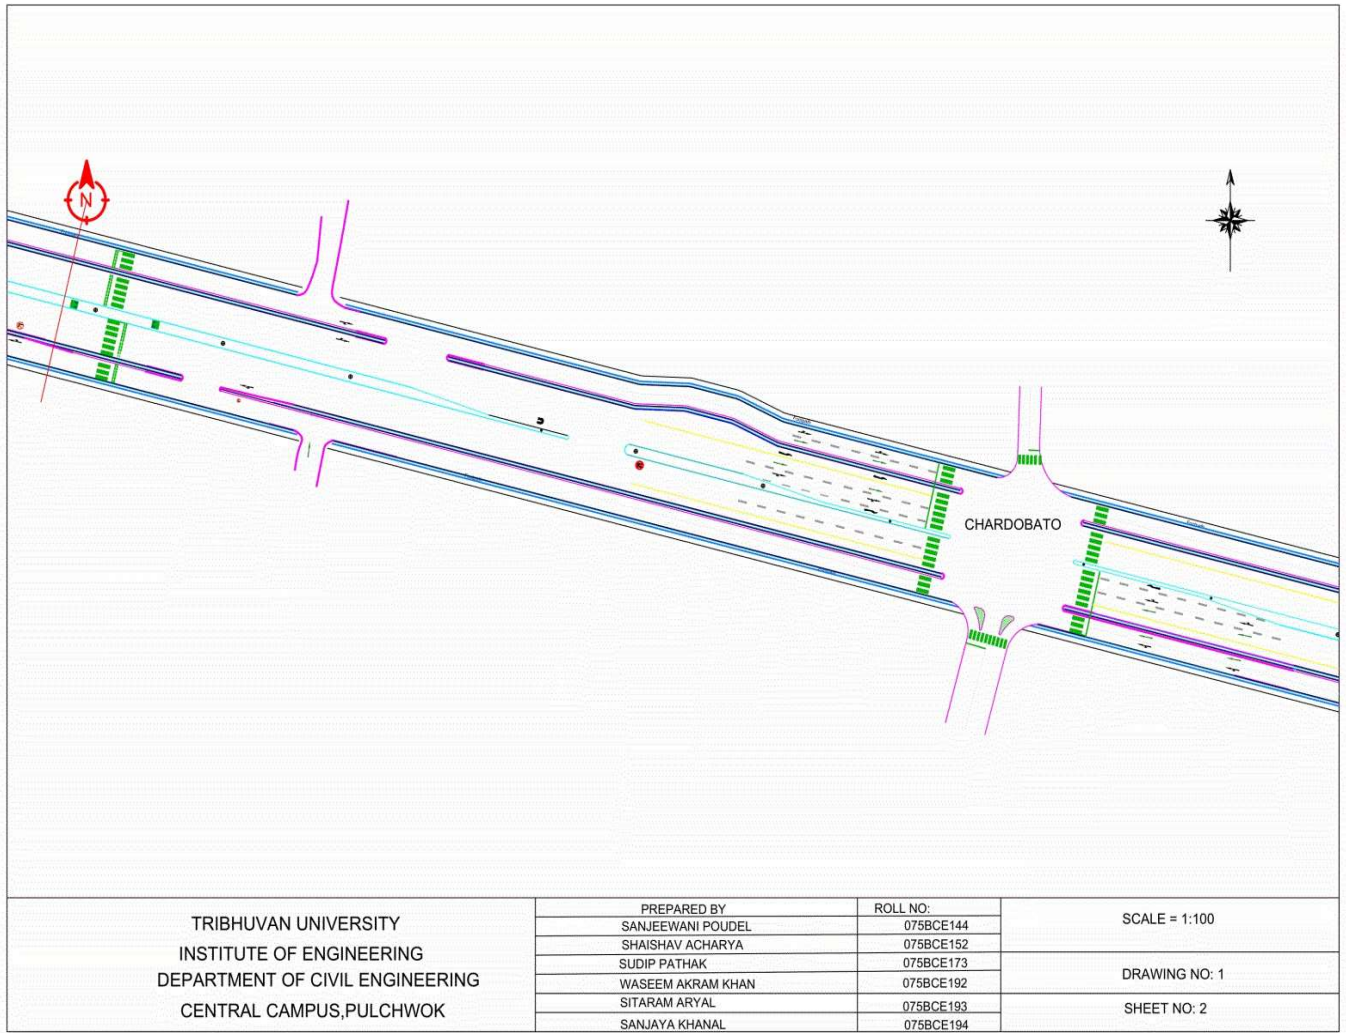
Proposed AutoCAD Plan for Chardobato Section
